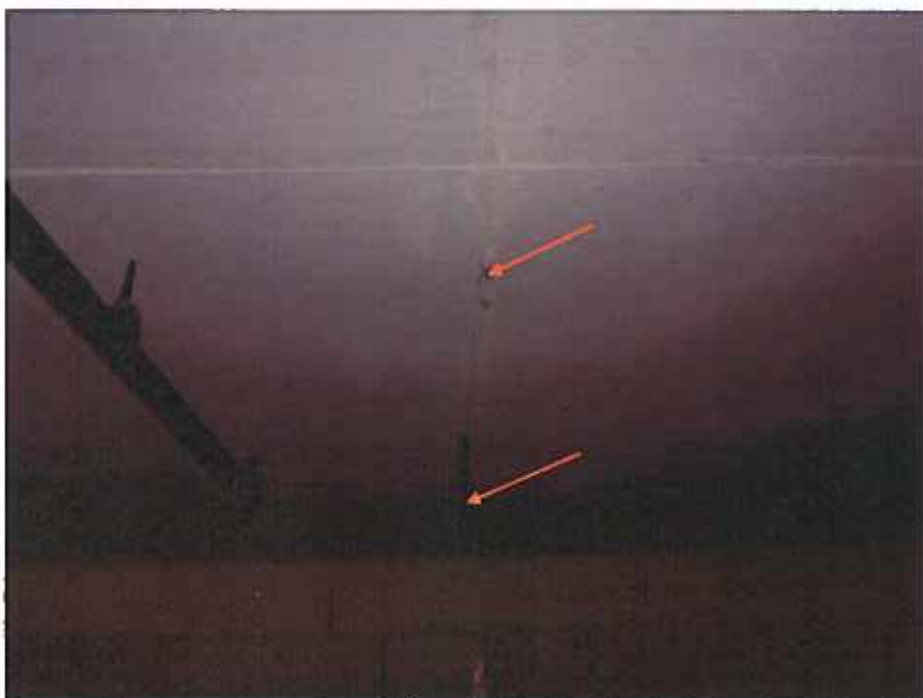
Efflorescence and rust stains on underside of podium slab; see photo below for floor staining at this location.
